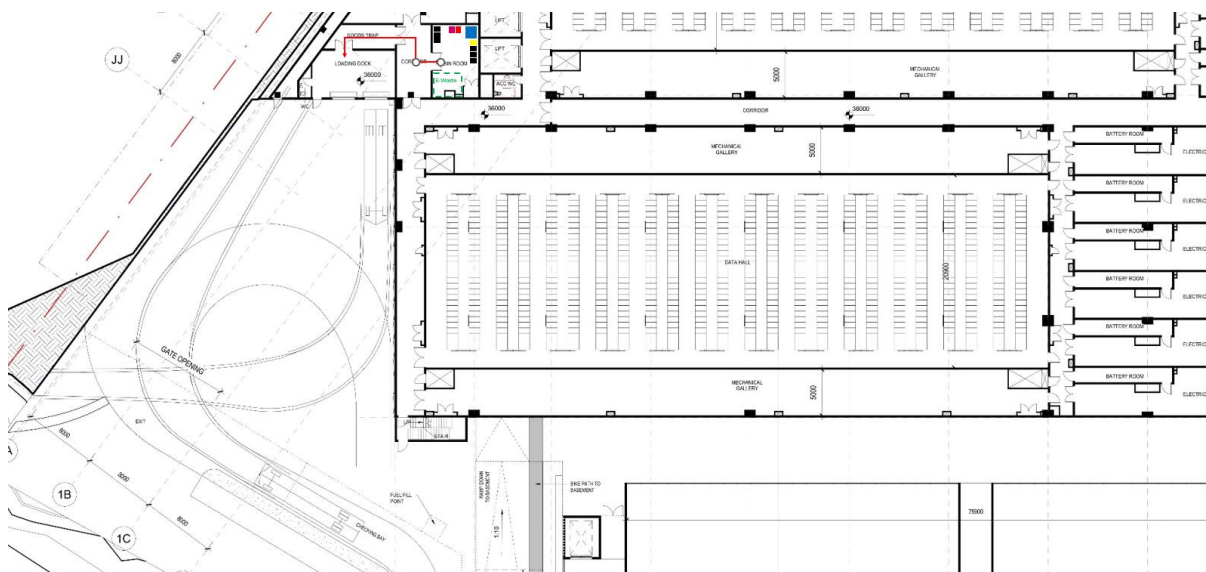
Swept Turning Paths for Standard 8.8m Long MRV Overlaid on Ground Floor Plan
